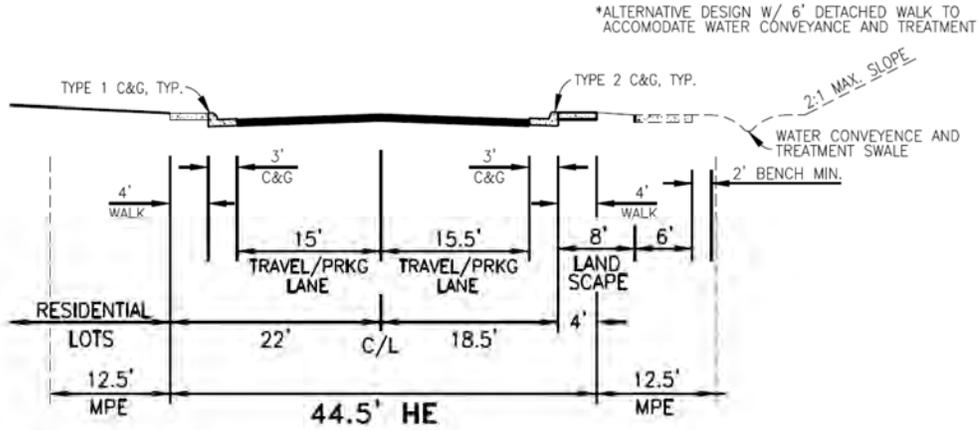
| Residential Street (Single-Loaded Alternative)
